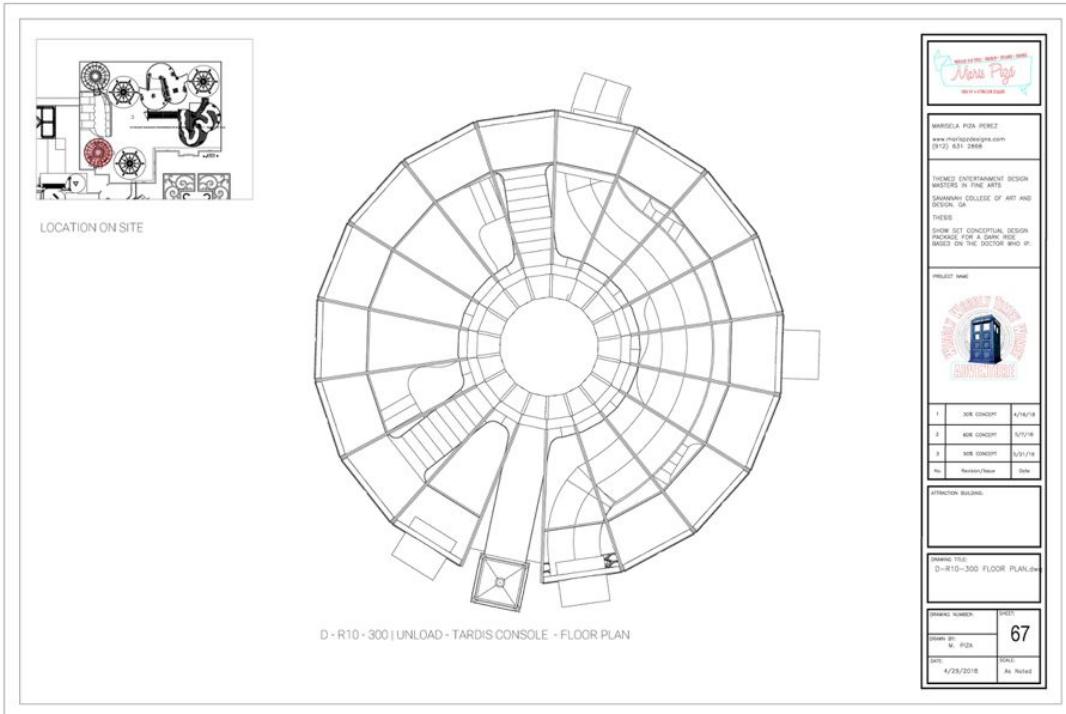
D-R10-300 | Unload - TARDIS Console - Floor Plan
